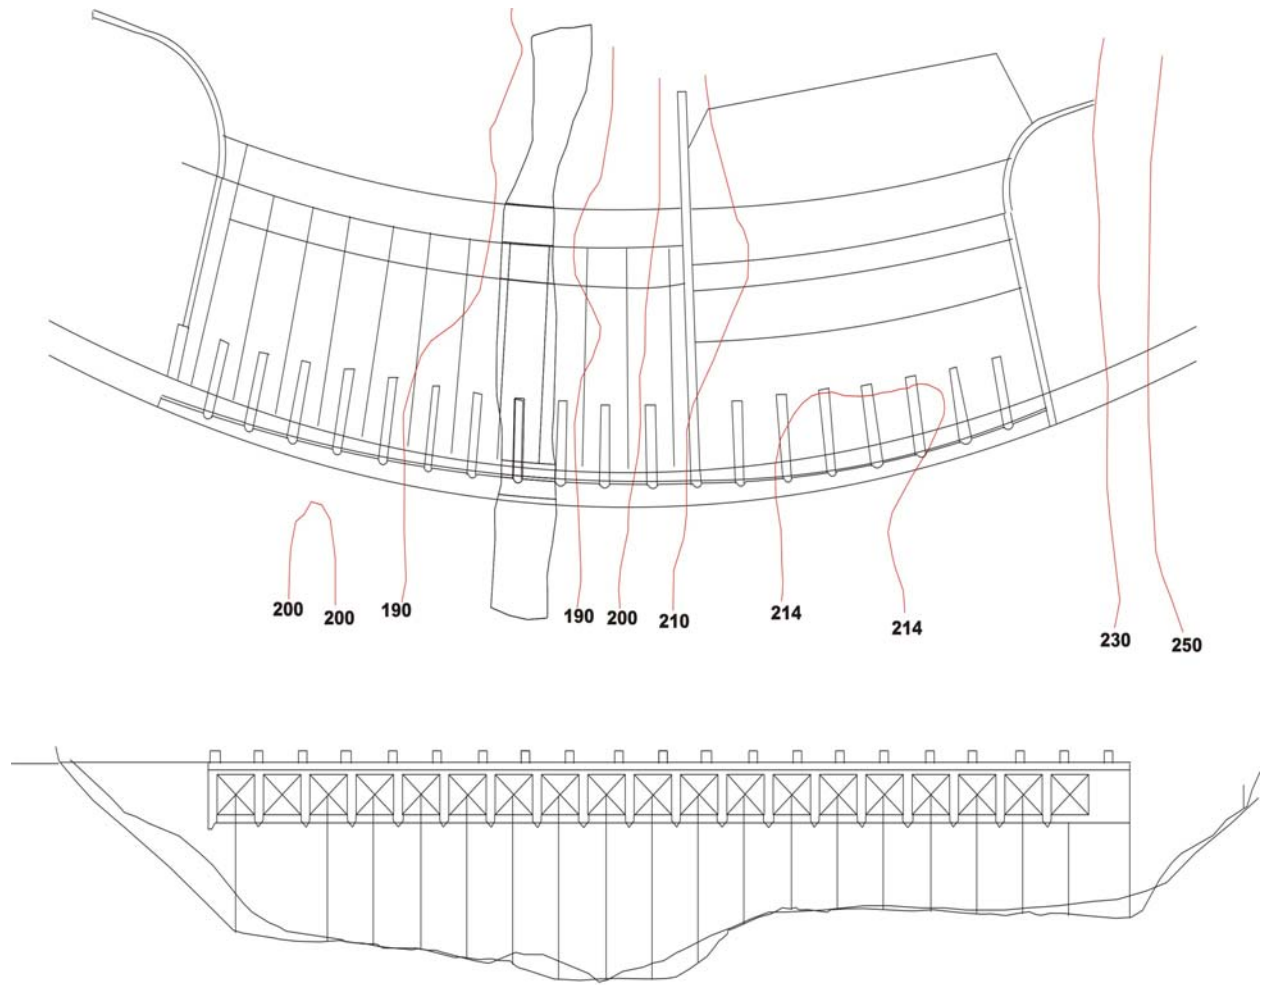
Detailed plan of the Indira Sagar dam and upstream ealevation
